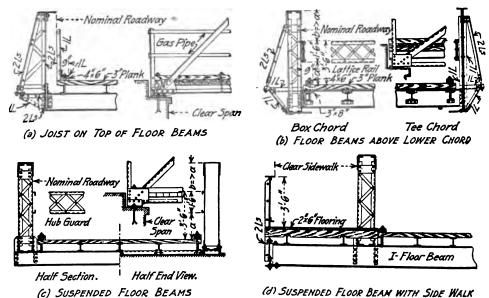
Details of Low Truss Highway Bridges. American Bridge Company.
